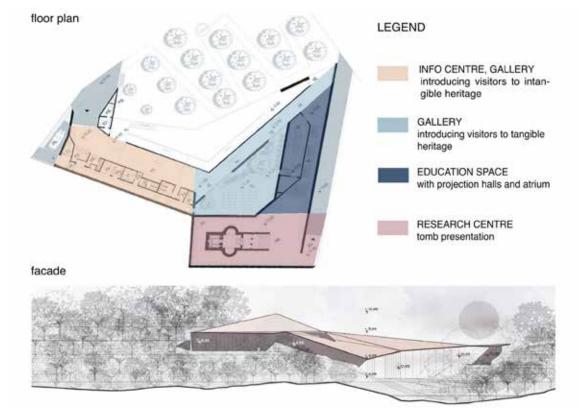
Floor plan and facade of the object (drawings by N. Petrović, E. Radenković, J. Jovanović, T. Jeremić, U. Korica and M. Jovančević, from Nikolić, Takač 2021).
